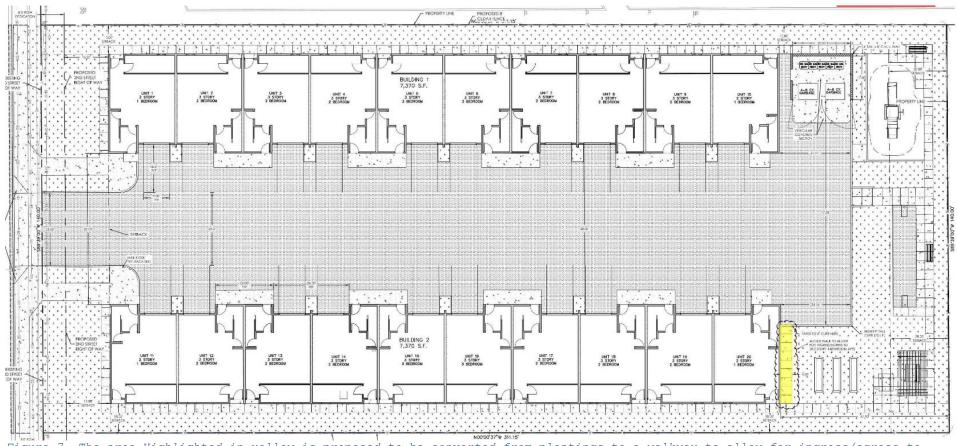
The area Highlighted in yellow is proposed to be converted from plantings to a walkway to allow for ingress/egress to the third-story 1-bedroom apartments.
